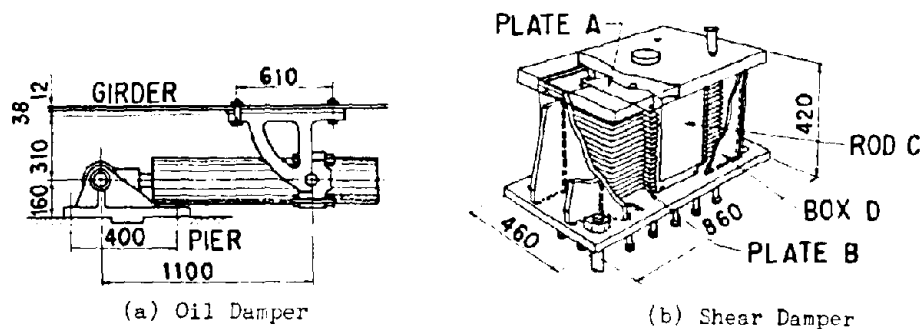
Various Damper Stoppers Adopted to Highway Bridges
